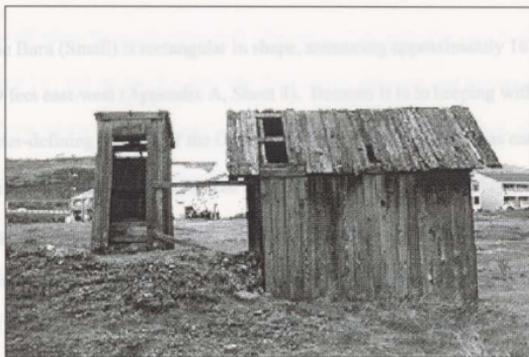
Outhouse, North Elevation Showing Connection to the Chicken Coop.
